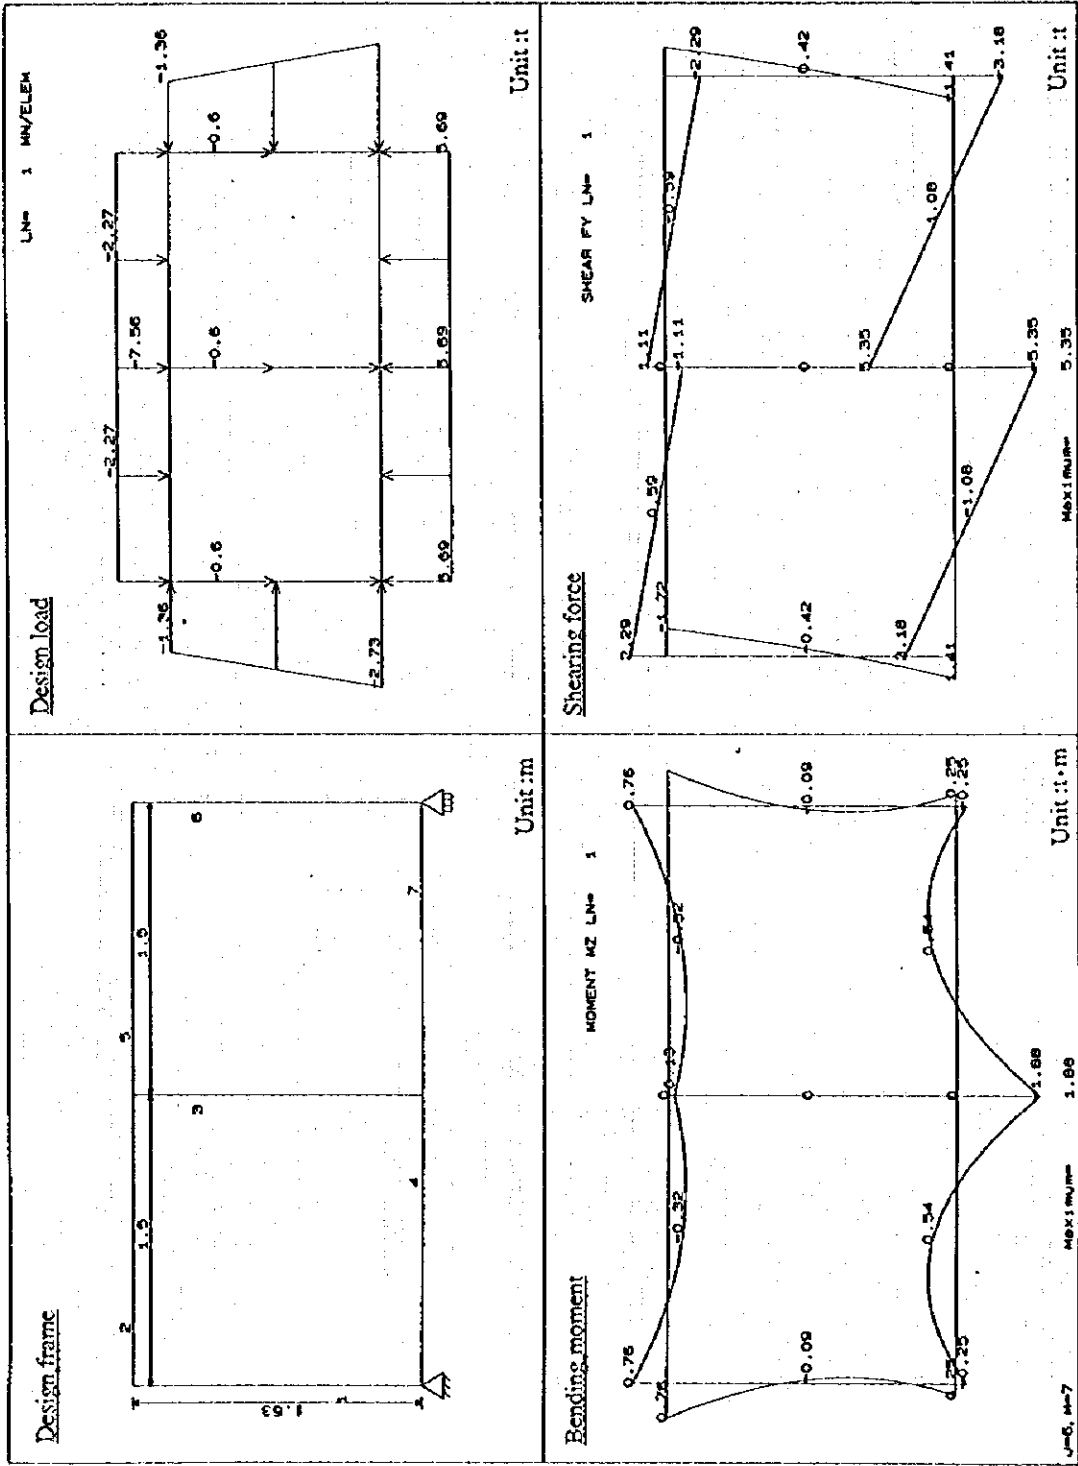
Stress Analysis on Transverse Section of Sluiceway Conduit (7/12)
